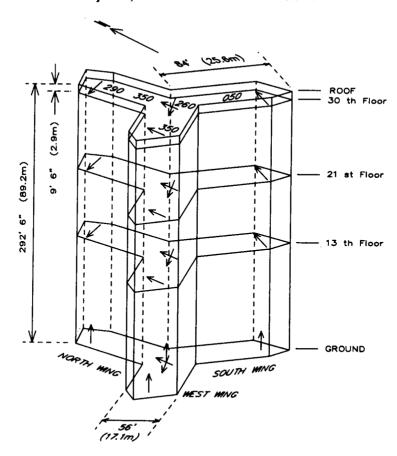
General instrumentation scheme of Pacific Park Plaza building in Emeryville
